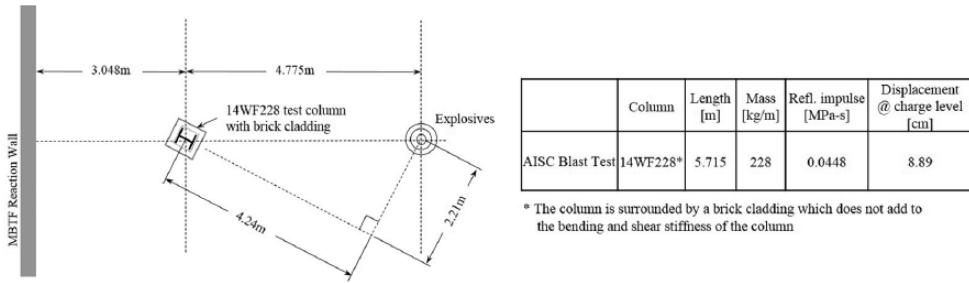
AISC Large-Scale Blast Test (Magallanes et al., 2006).
